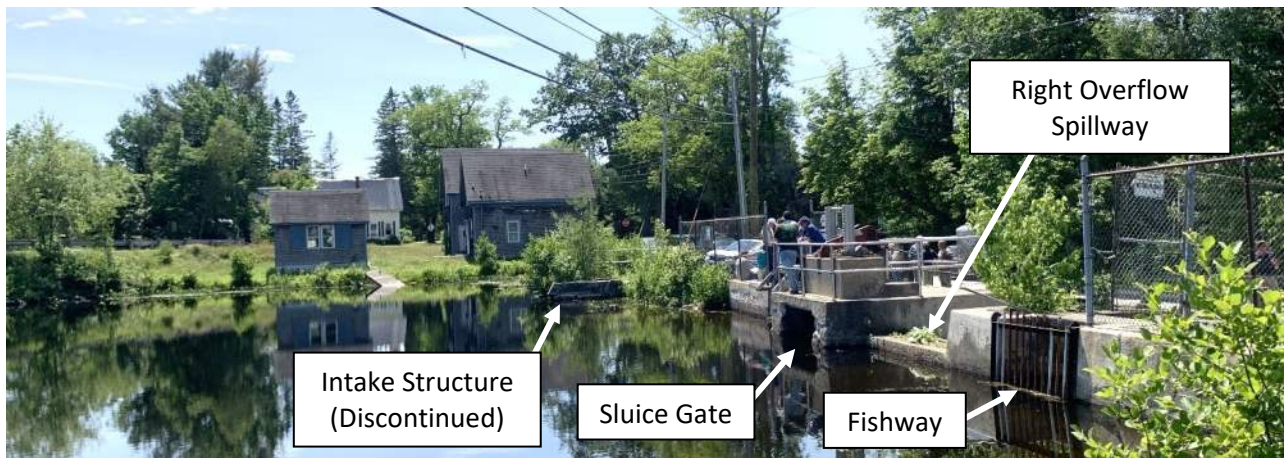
View of dam from right upstream shore, looking left/downstream.
